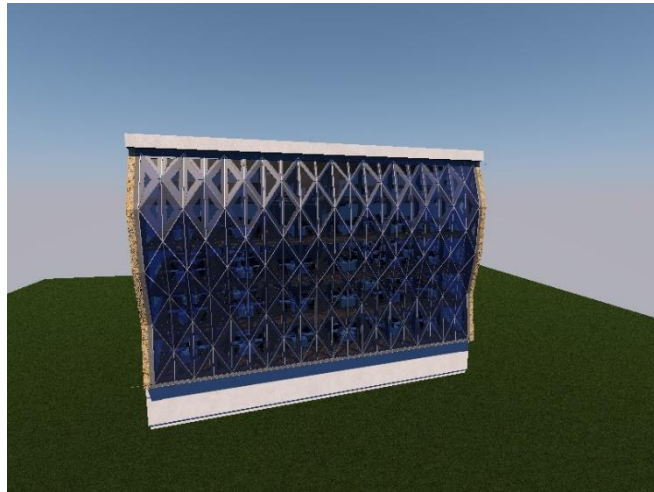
PARAMETRIC CURTAIN WALL
